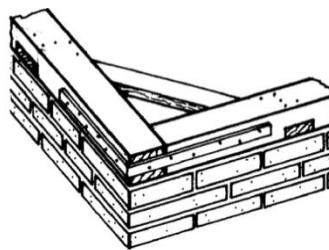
Stiffening module at a wall corner, by Gernot Minke
